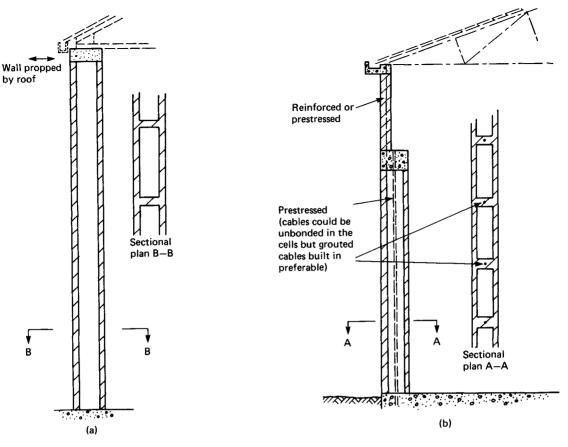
Typical forms of cellular (diaphragm) wall. (a) Unreinforced (wall spans from ground to roof). (b) Prestressed (or reinforced). Wall acts as vertical cantilever
